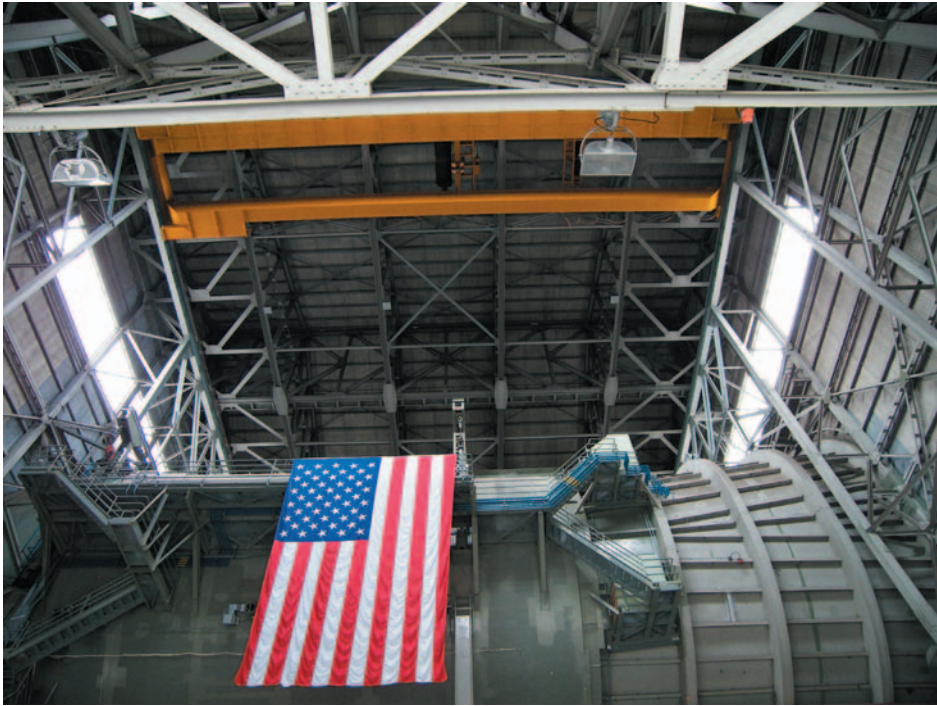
40 by 80 Foot Wind Tunnel entry ceiling
